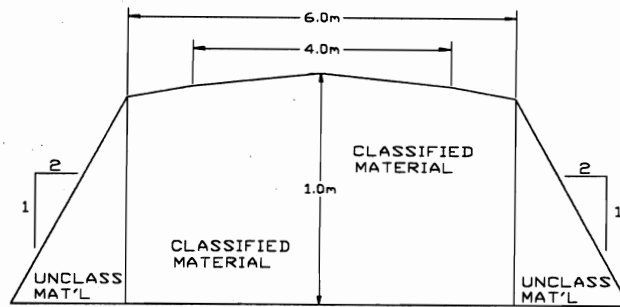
Typical cross-section of a 13.4-km road from Imnakuk to the coast.
